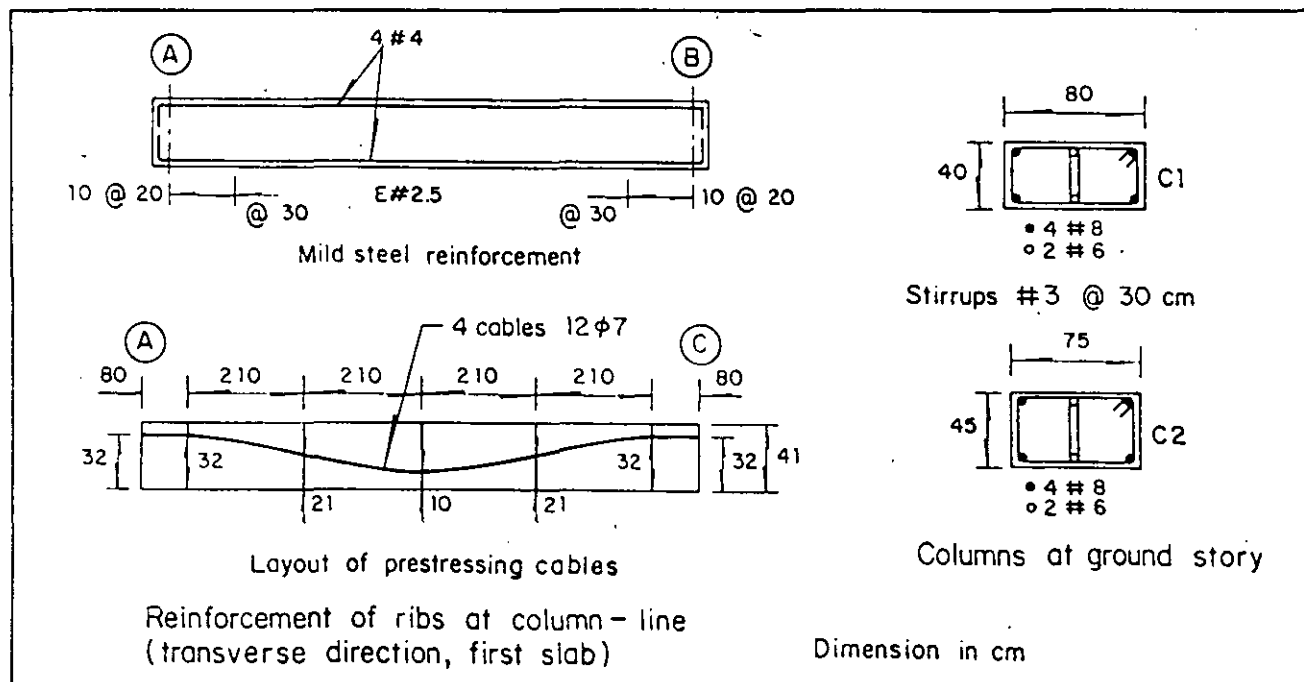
Typical reinforcing details of structural members of the TAM Building.
